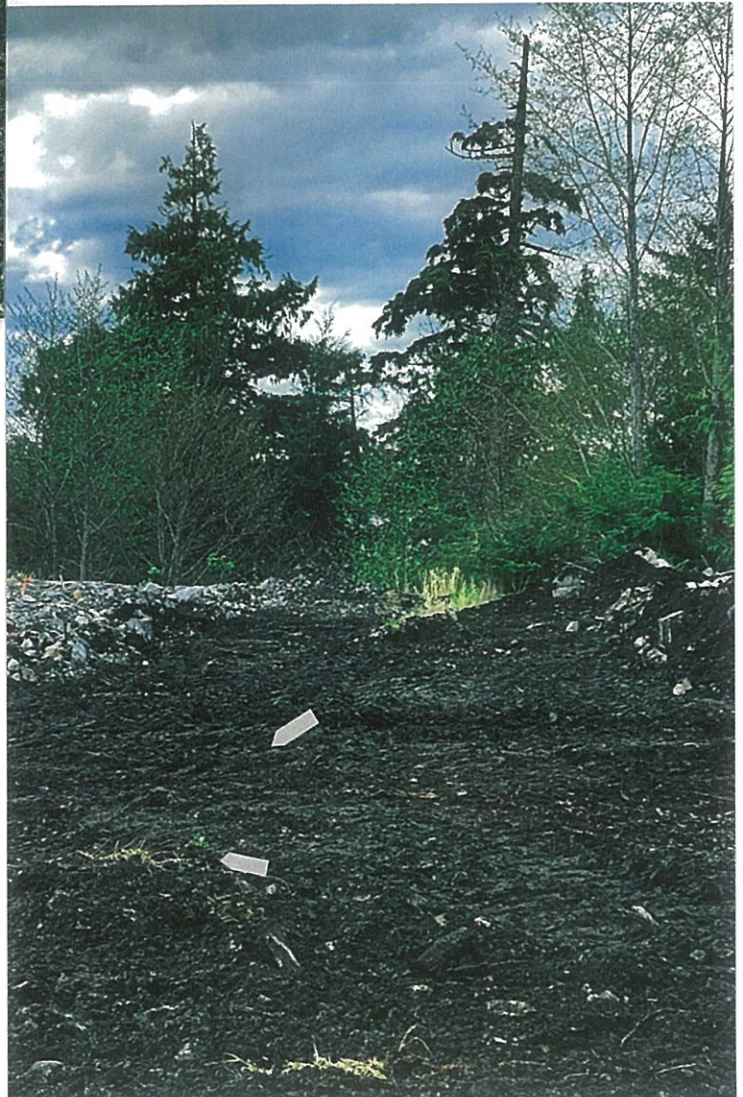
5/4/20 view looking SW between Biocells #3 & #4, where its adjacent rocked containment berms had been removed and used as fill for the PL-33 excavation.
